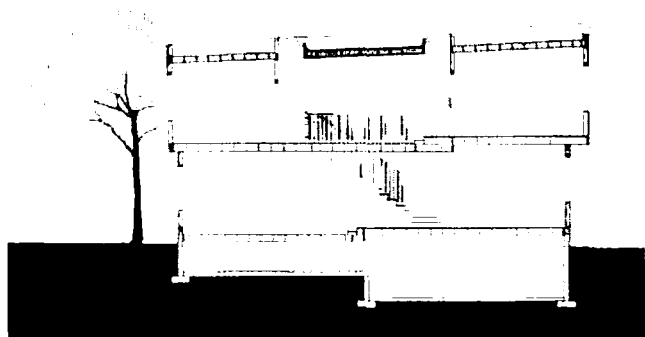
Building section – Criteria Addressed: Expanding Upward, Ceiling Height Variety, Opening in Roof, Borrowed Space.
